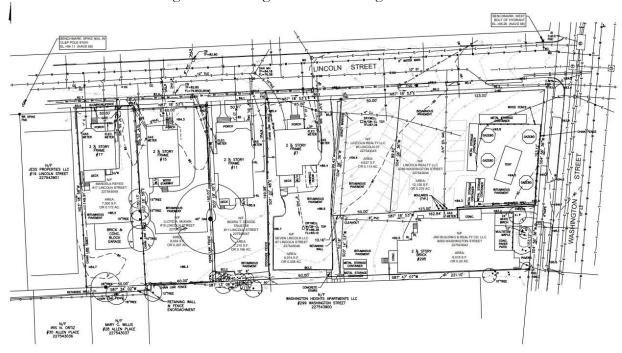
Existing Conditions – Fuss & O'Neill April 4, 2023
